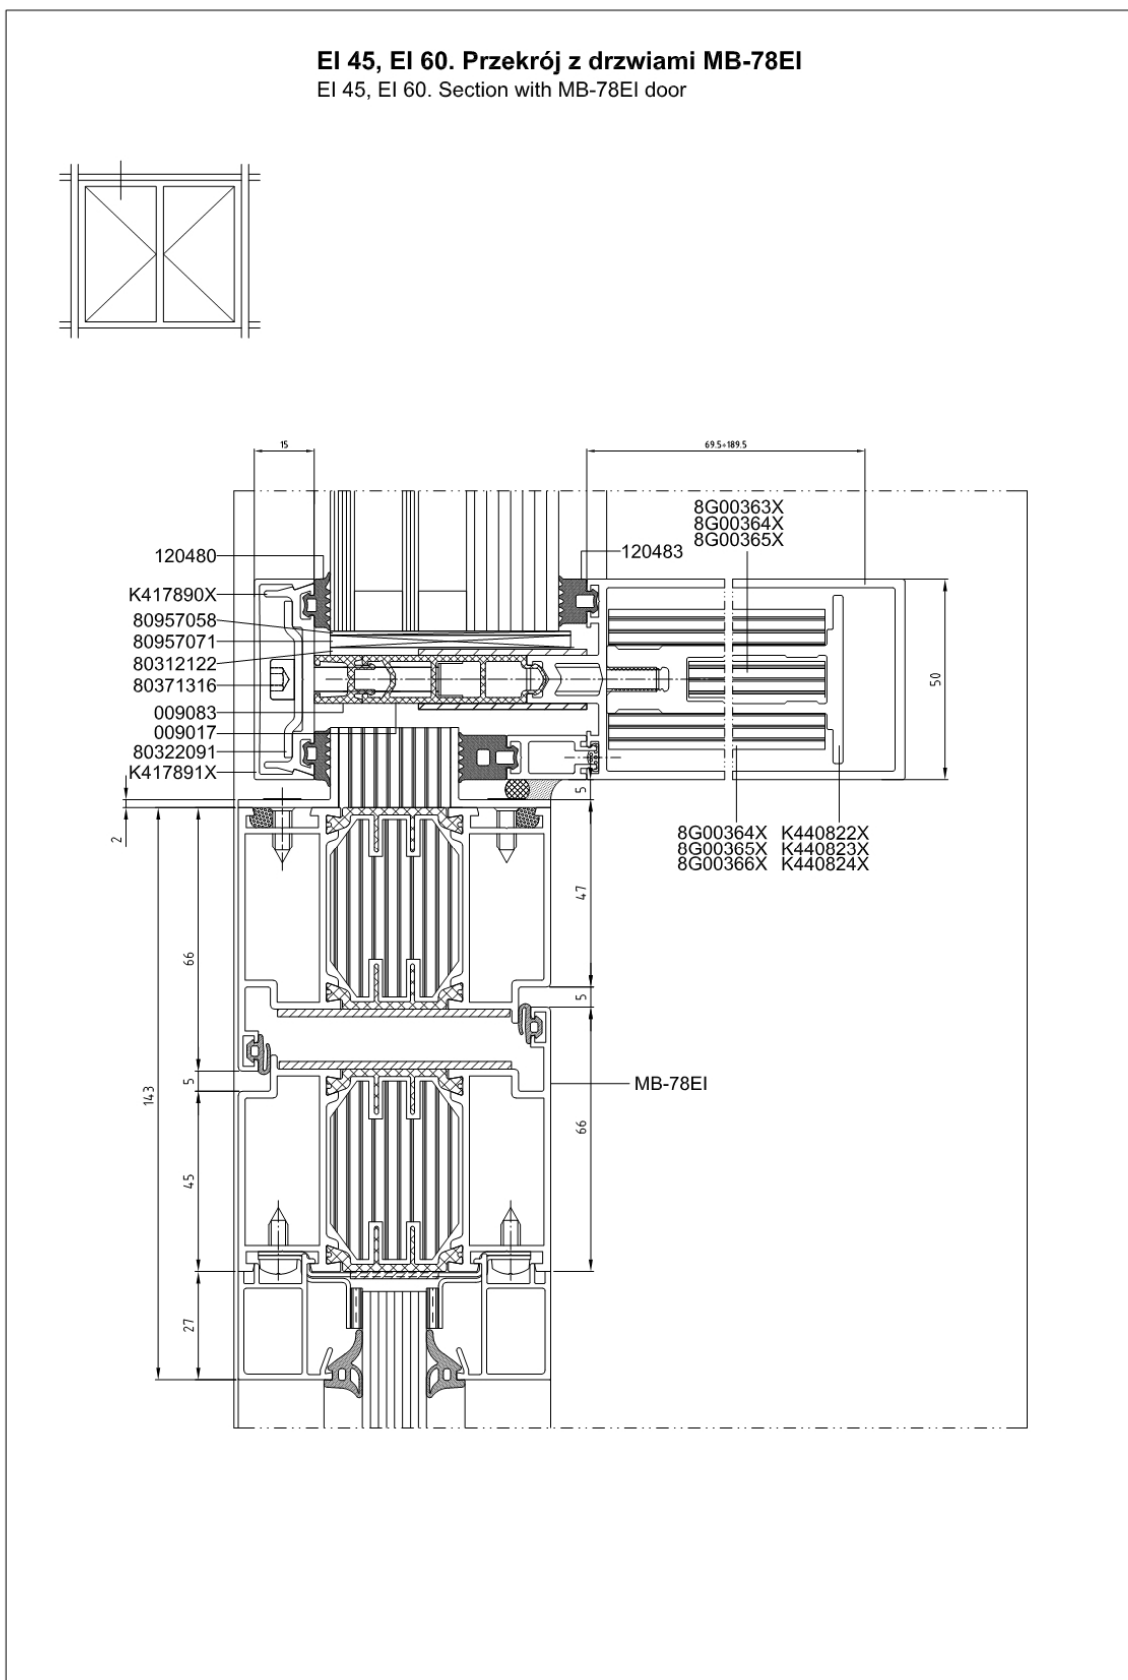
Installation scheme of the MB-78EI system door fixed in the MB-SR50N EI EI60 system wall (fixing details according to the MB-78EI door system classification – vertical section)
